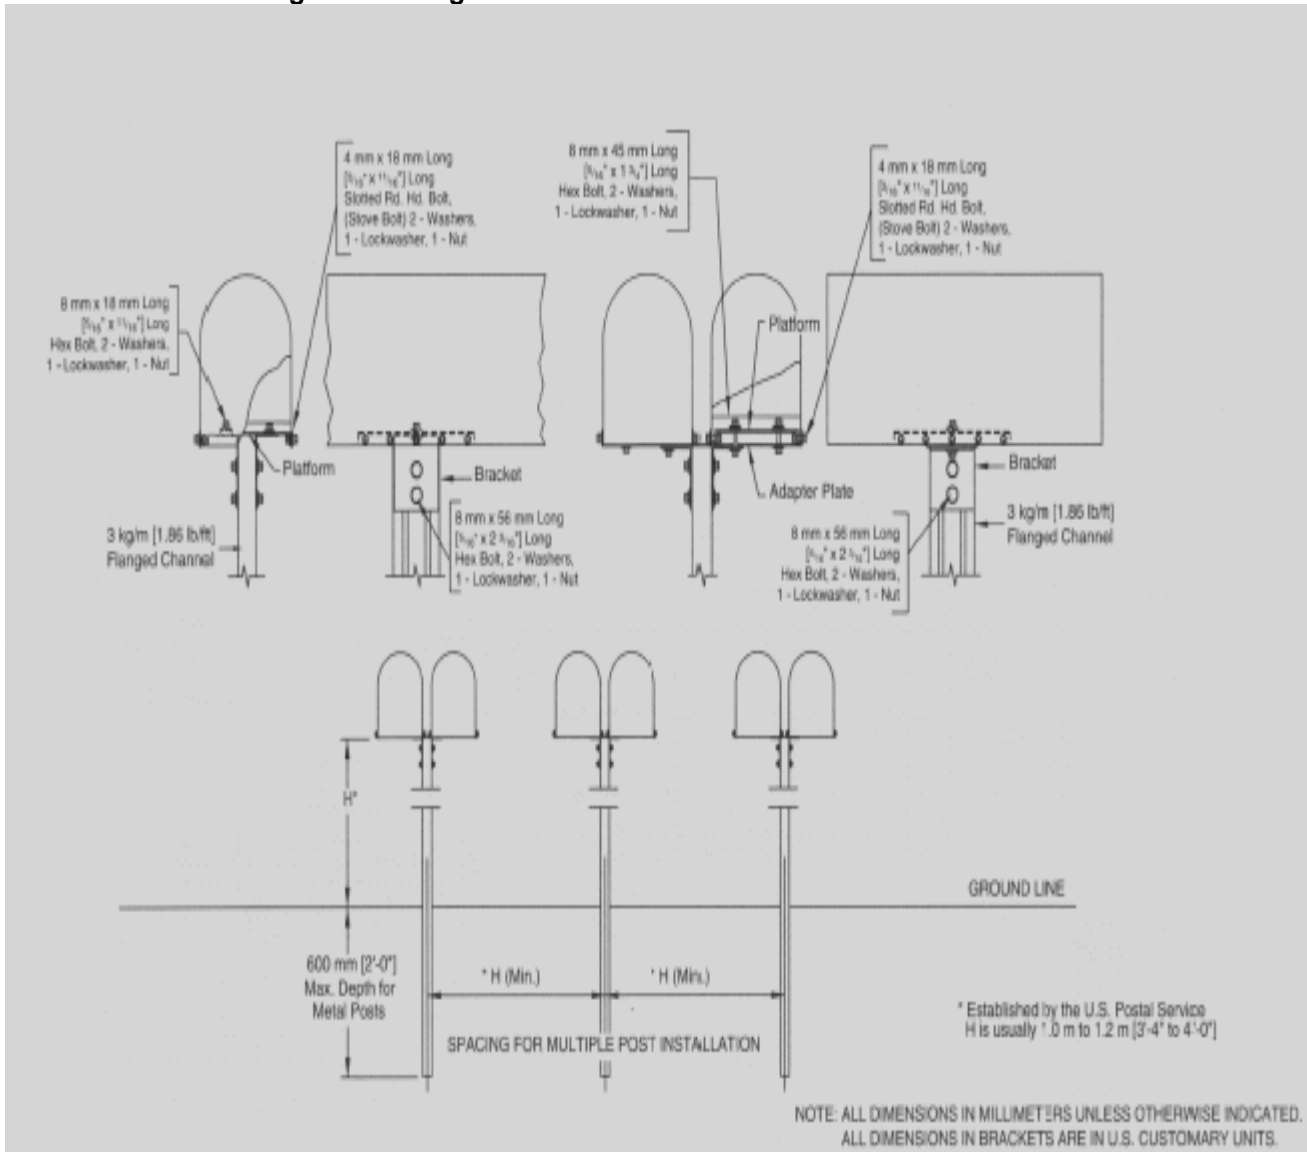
Single and Multiple Mailbox Assemblies - Series C
